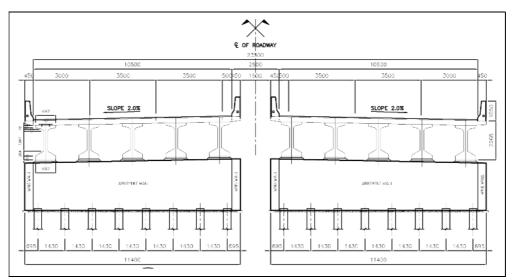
Typical Cross Section of PCDG Bridges of Pursat Bypass
